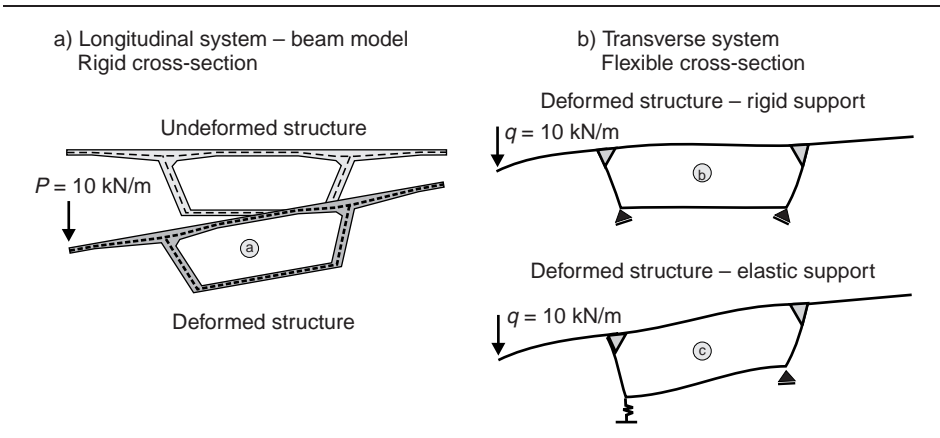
Distortion of a hollow box girder bridge at midspan; beam model (left) and real deformations (right, bottom)
